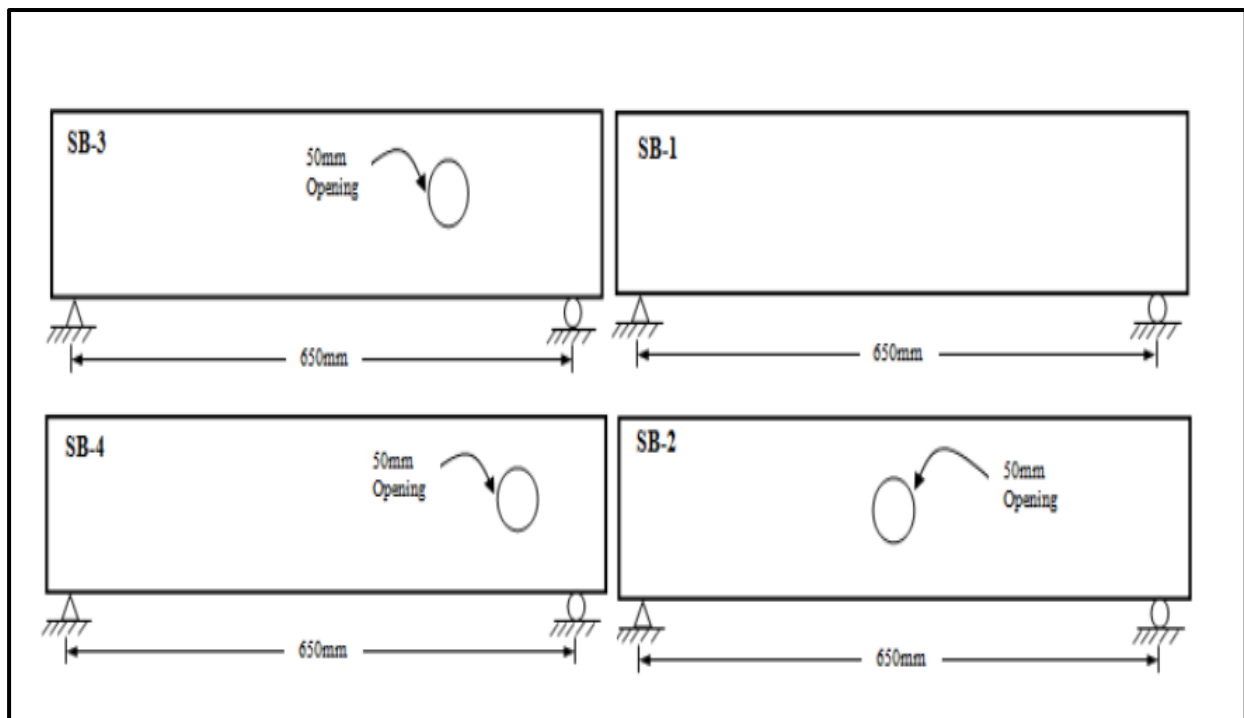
2: Location of openings in beams (Aziz, (2016))
